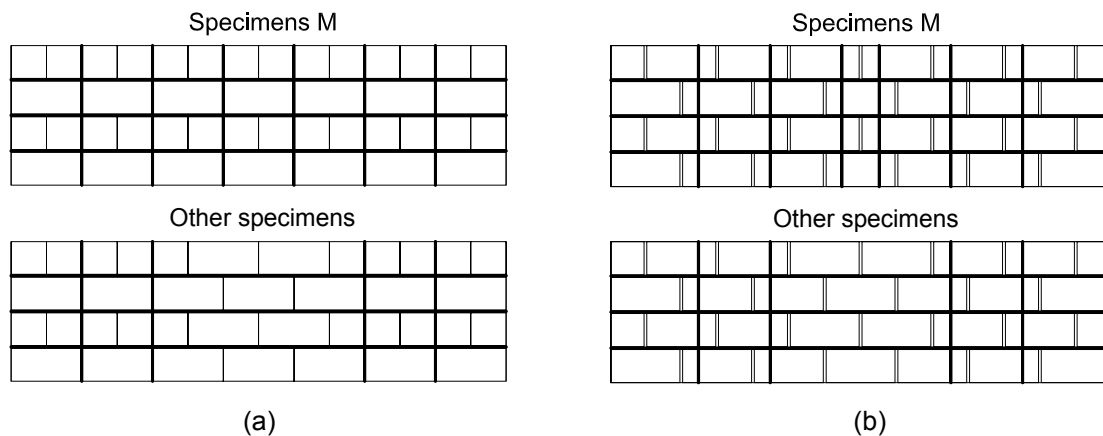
Location of the vertical reinforcements in four point load configuration: (a) masonry beams built with 3C-units and (b) masonry beams built with 2C-units.
